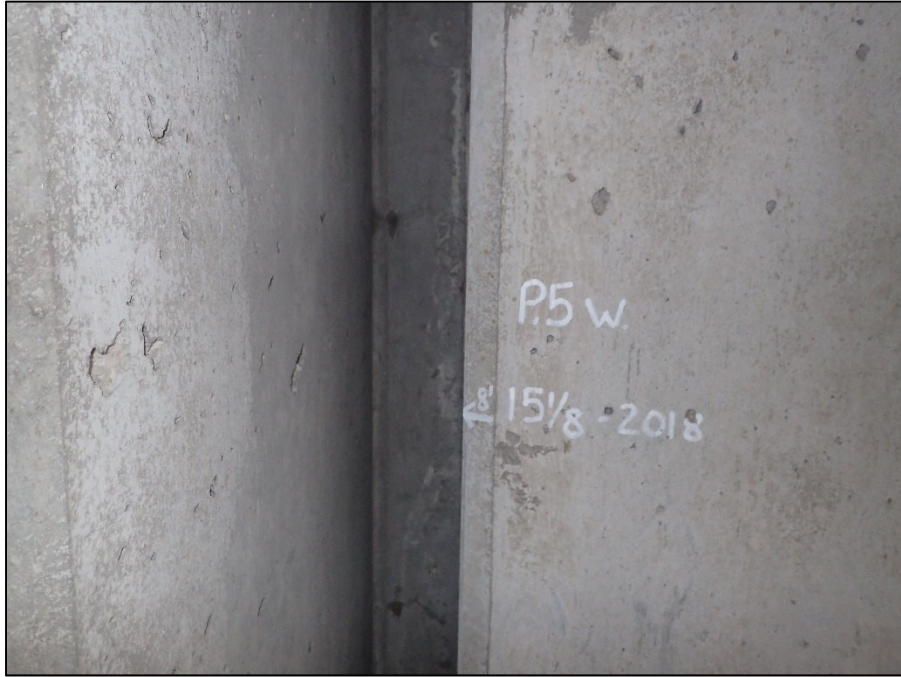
Pier 5, west side of south wall; 15-2/16” measurement of tower rotation
